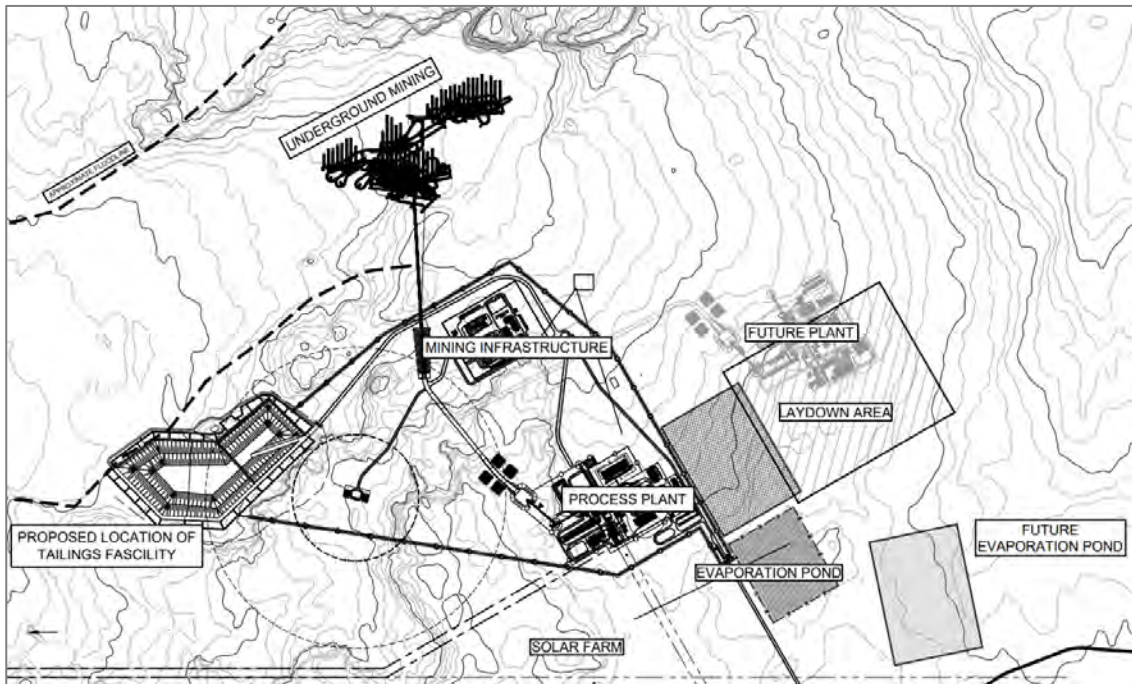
Proposed infrastructure and Spatial Placement of Key Infrastructure at Dasa Uranium Project
